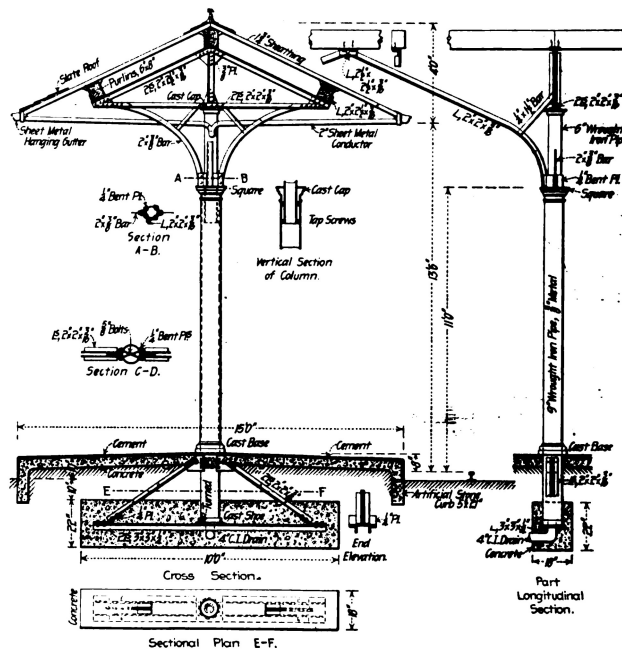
CONCRETE PLATFORM AND UMBRELLA ROOF OF UNION STATION AT DAYTON, O.
